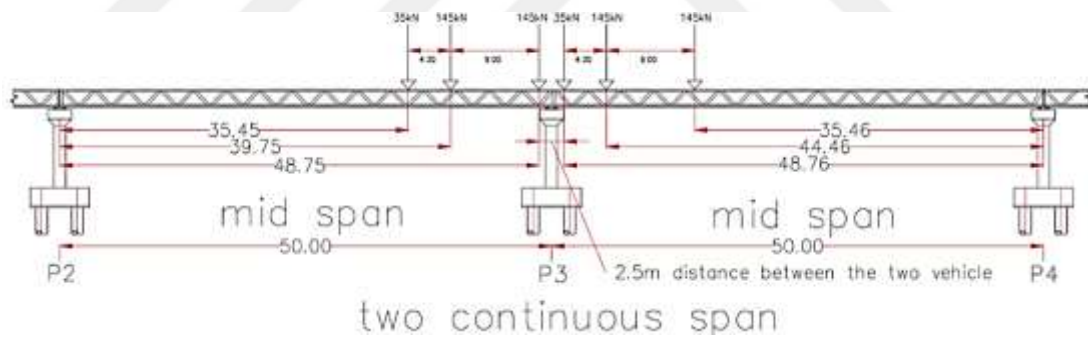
Truck Design Live Load at Support Pier (p3)
